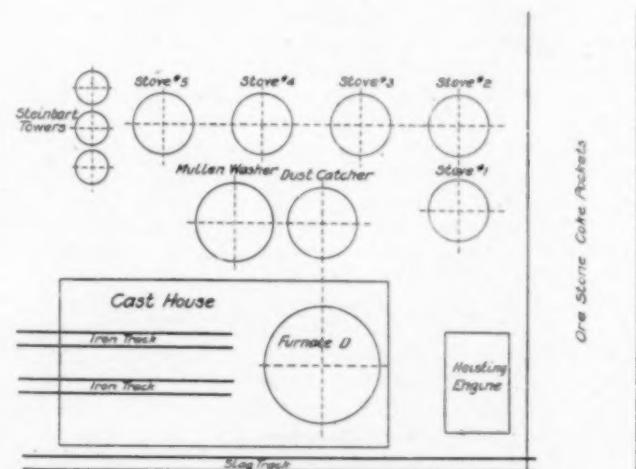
GENERAL PLAN OF BLAST FURNACE PLANT.
